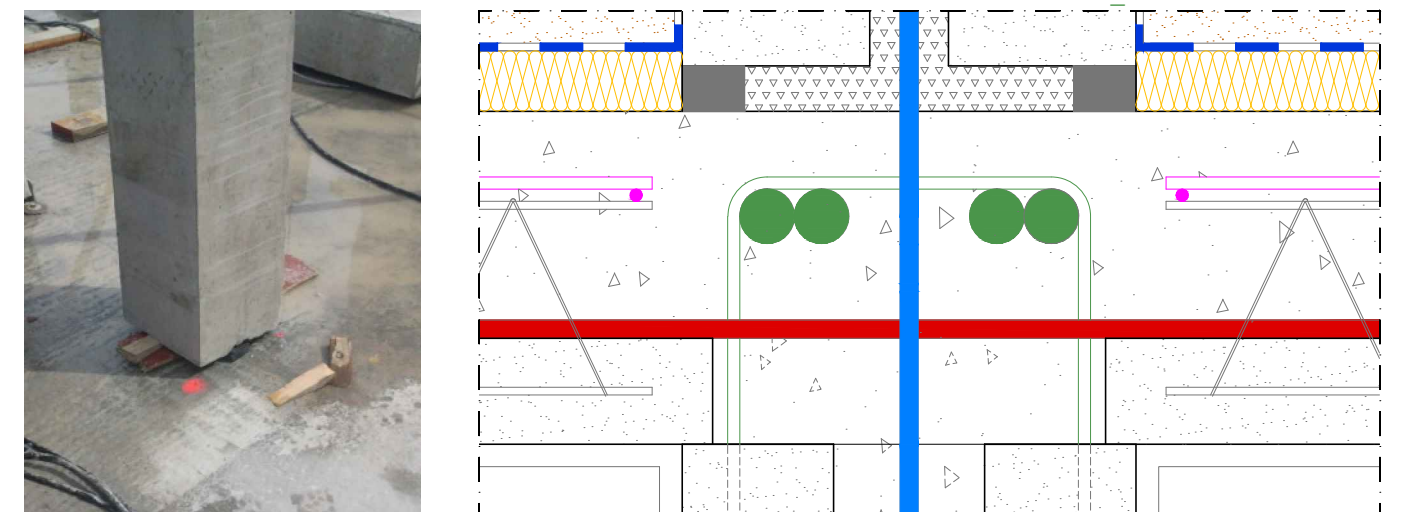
UNION COLUMN-BEAM-FLOOR \_ S:1/10
